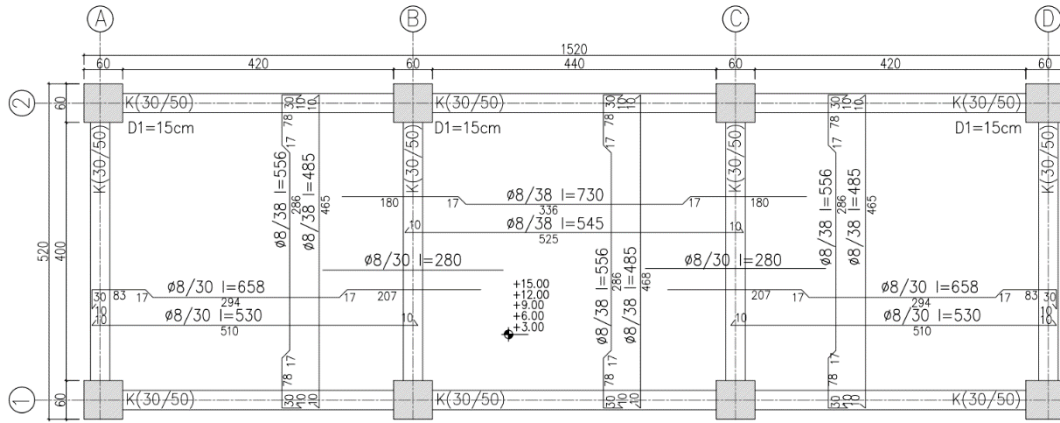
Typical static floor plan for mid/low-rise buildings type.
